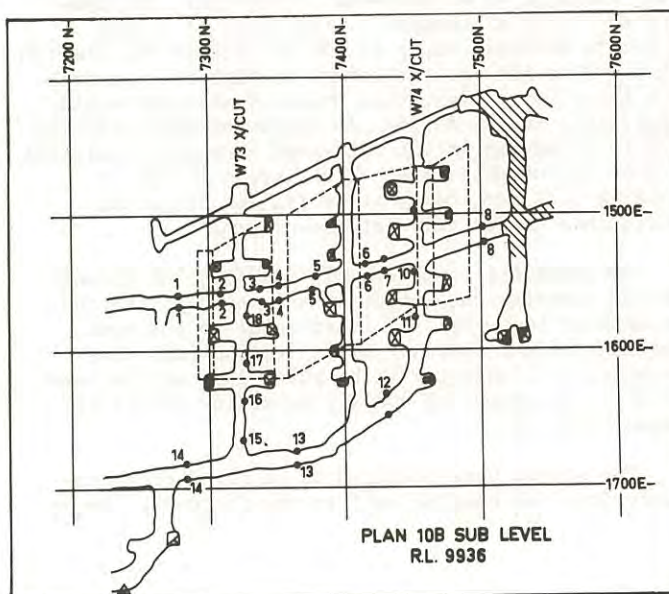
Plan of 10B sublevel 650 copper orebody.
